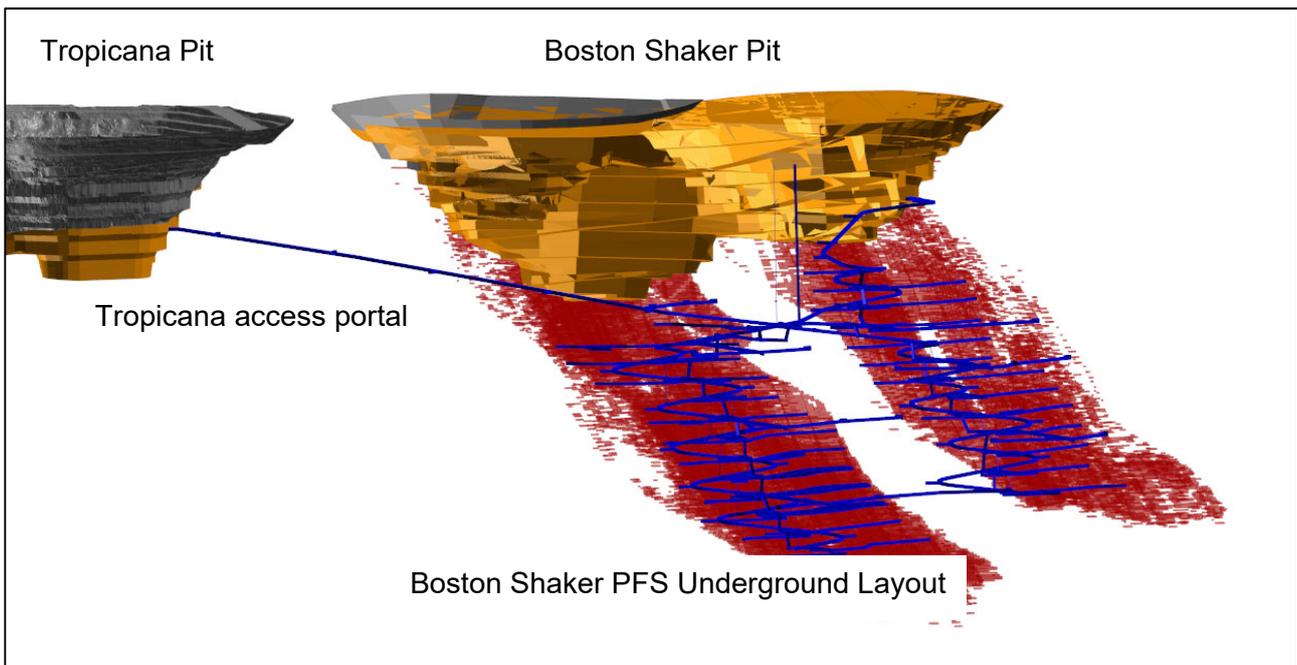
Boston Shaker Open Pit, Underground Development and access link to Tropicana
